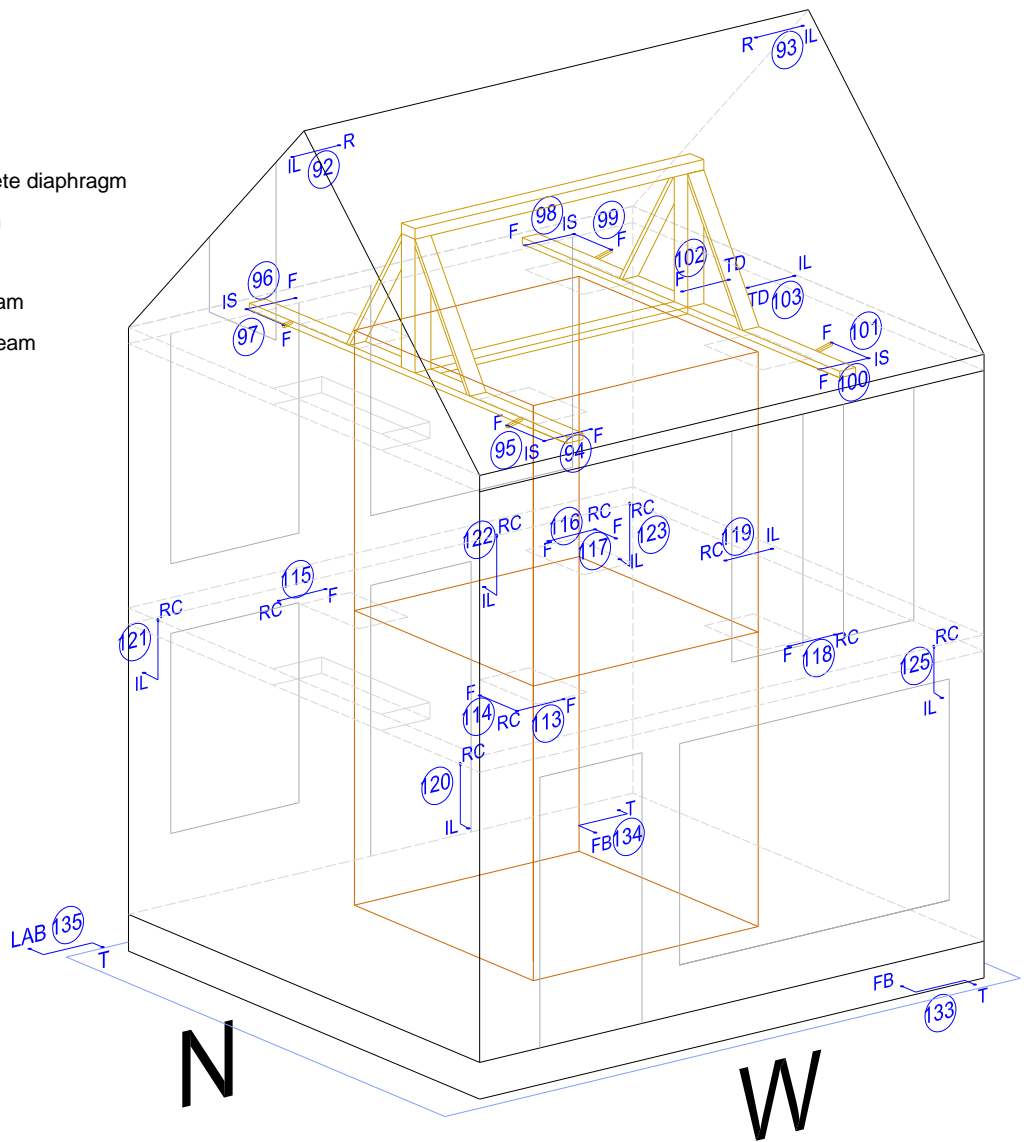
Linear potentiometer 3D view: foundation, first floor, second floor and roof diaphragms.
